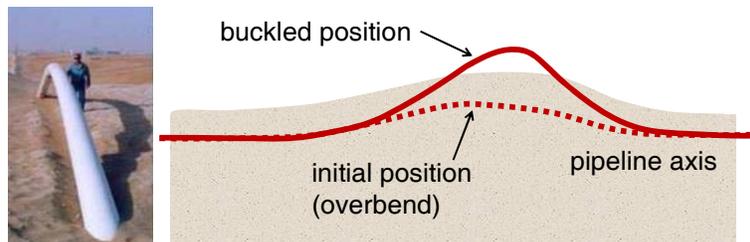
Beam buckling of buried pipeline due to excessive axial loading.
